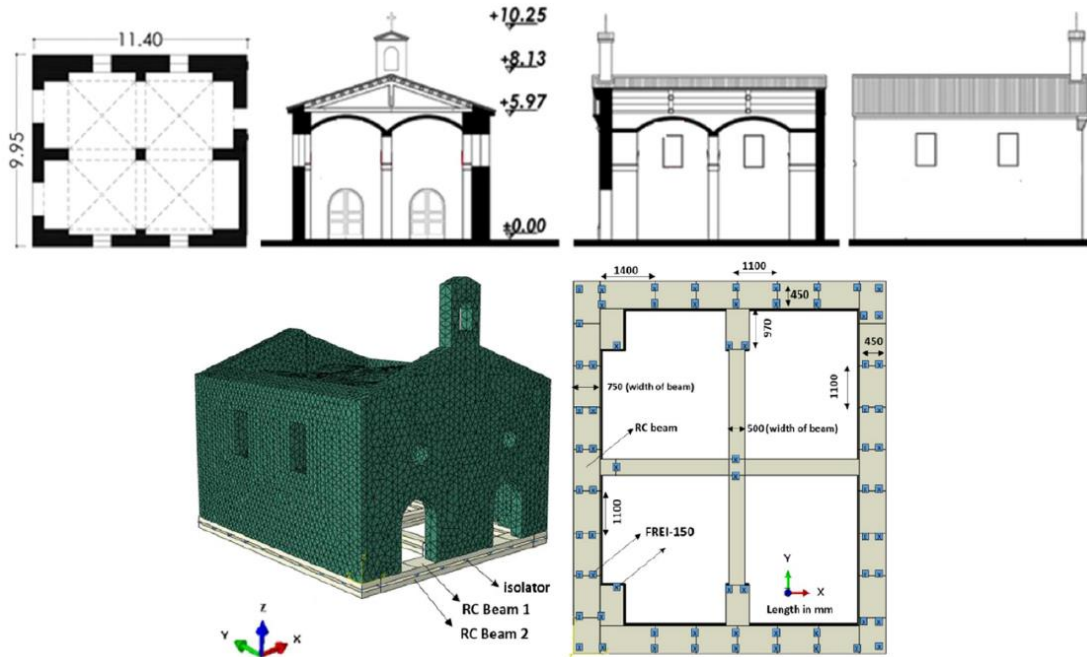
Top: drawings of the masonry church: plan, two sections and an elevation lateral view. Bottom: FE model of the isolated masonry church and arrangement of FREIs.
